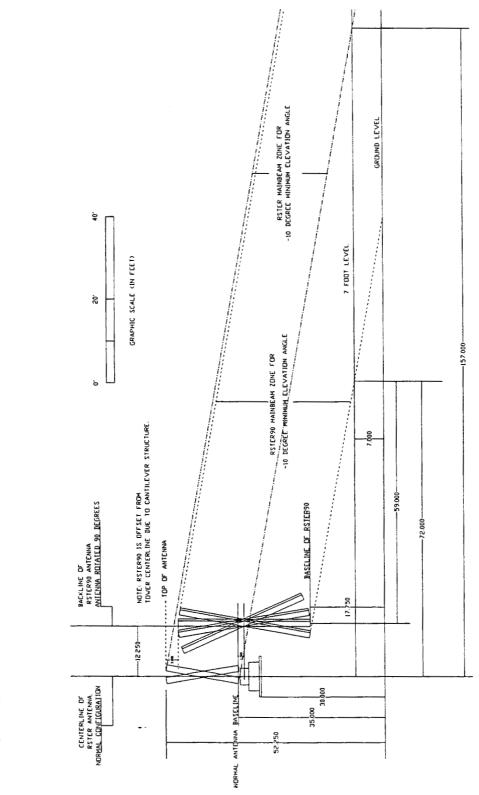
Layout of the Alternate RSTER Site at the Makaha Ridge Facility
